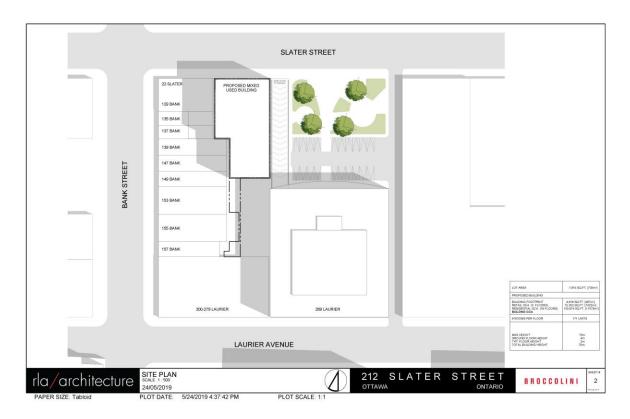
Preliminary site plan of the proposed development illustrating its proximity to the three-storey commercial heritage properties fronting onto Bank Street, and the mid-rise office building on Laurier Avenue. Source: RLA
